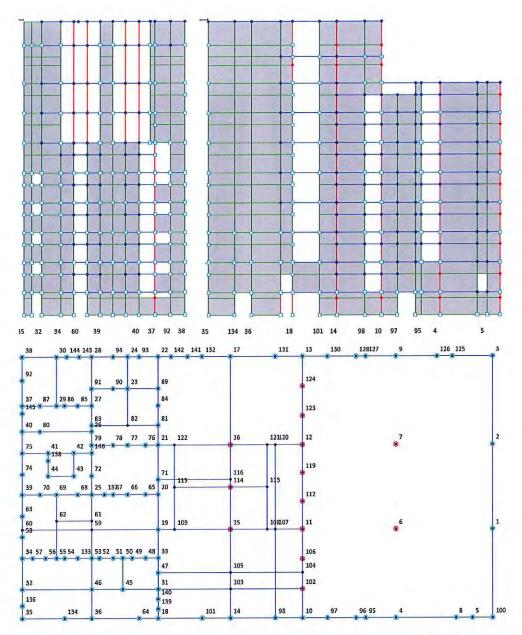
Model column line and elevation plots; bottom figure shows all elements at all levels
